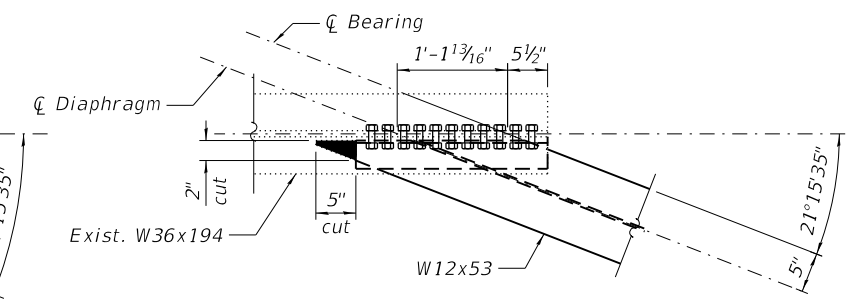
DETAIL OF END DIAPHRAGM SEAT ANGLE FOR BEAMS 2, 4 & 5 AT PIER 3
